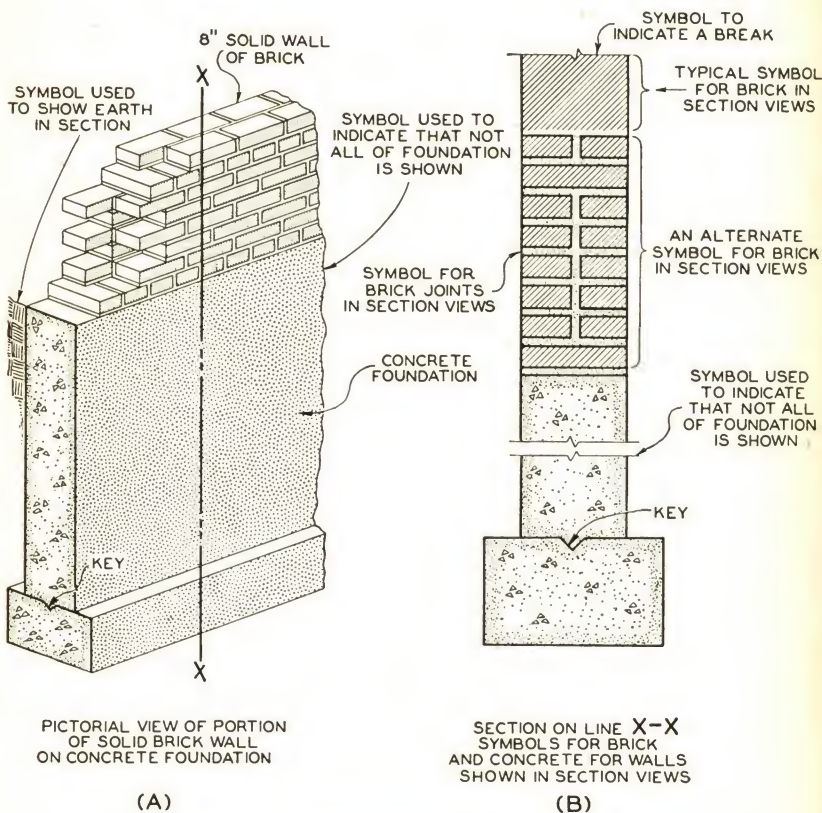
Pictorial and Section View of a Solid Brick Wall
